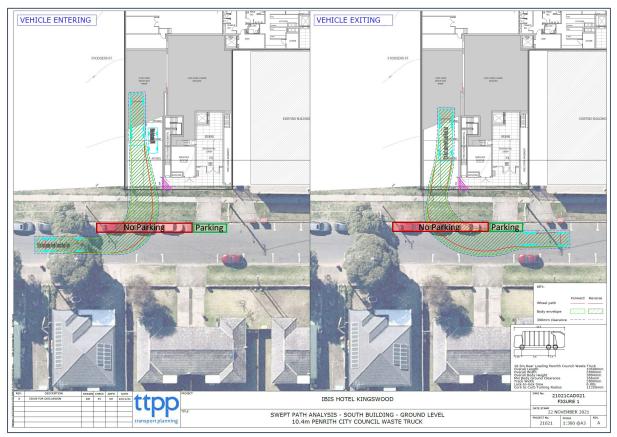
Proposed adjustments to on-street parking in Rodgers Street
